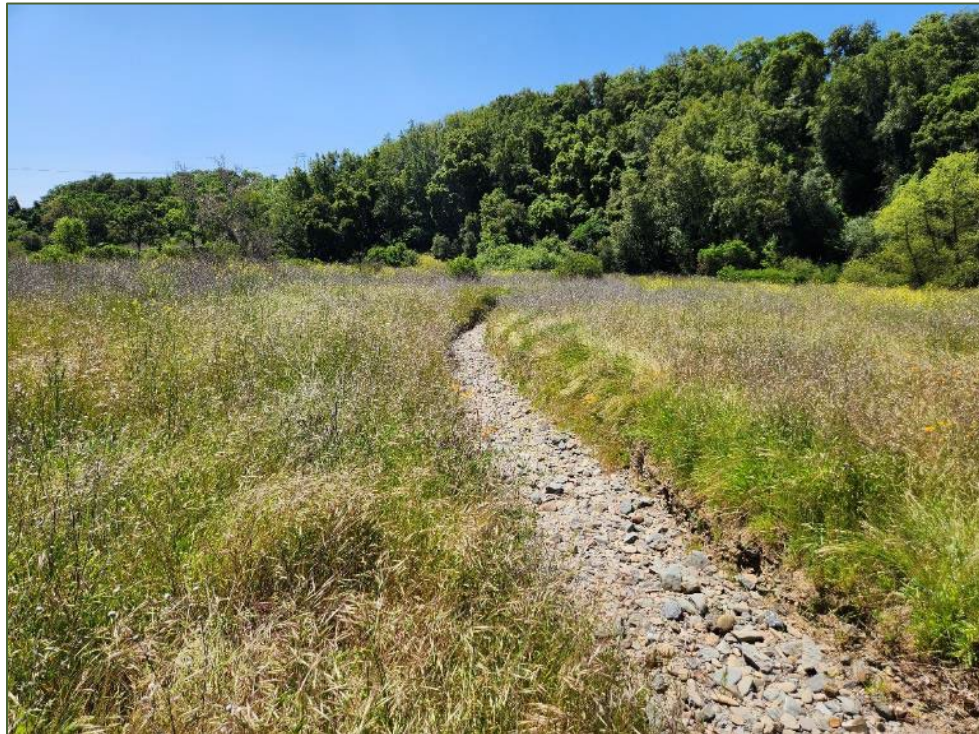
\*. Year 6 (2024), facing southwest toward ID01. Photo taken 5/8/2024
